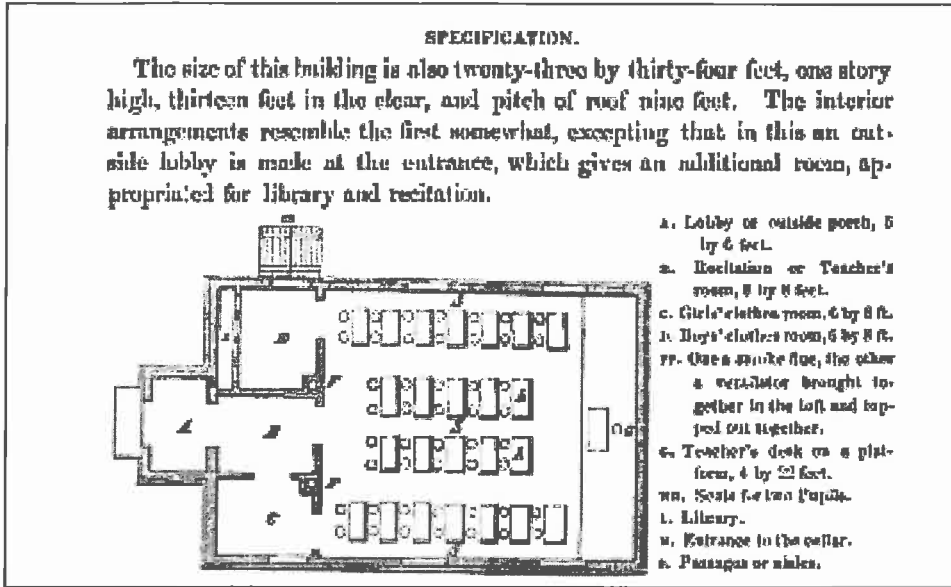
Thomas Henry Burrowes, *Pennsylvania School Architecture: A Manual of Directions and Plans for Grading, Locating, Construction, Heating, Ventilation, and Furnishing Common School Houses*. Harrisburg, PA: A. Boyd Hamilton, printer, 1855.
